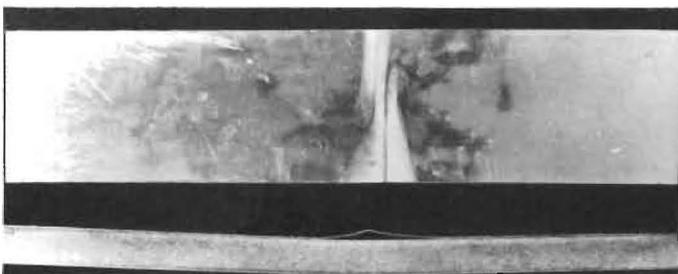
\_ ALP\_ SANDWICH BEAMS AND PANELS IN FACE\_WRINKLING MODE
